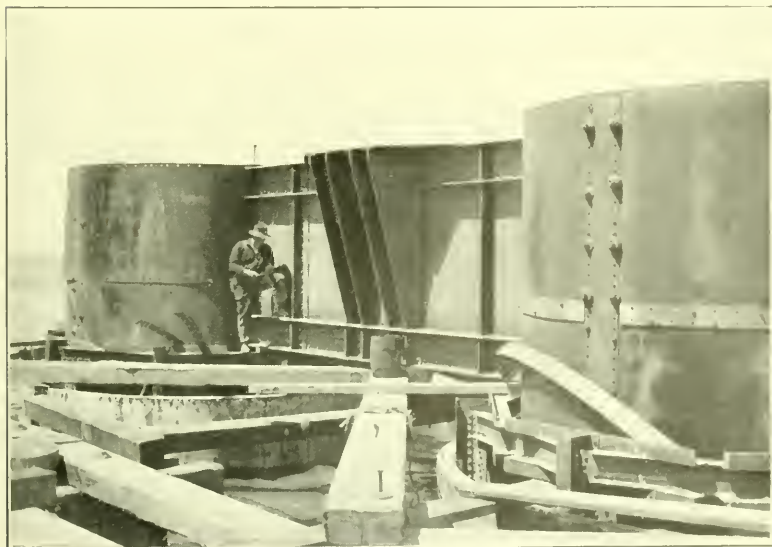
CYLINDERS IN PLACE, ABUTMENT 4, DUMBARTON POINT.
